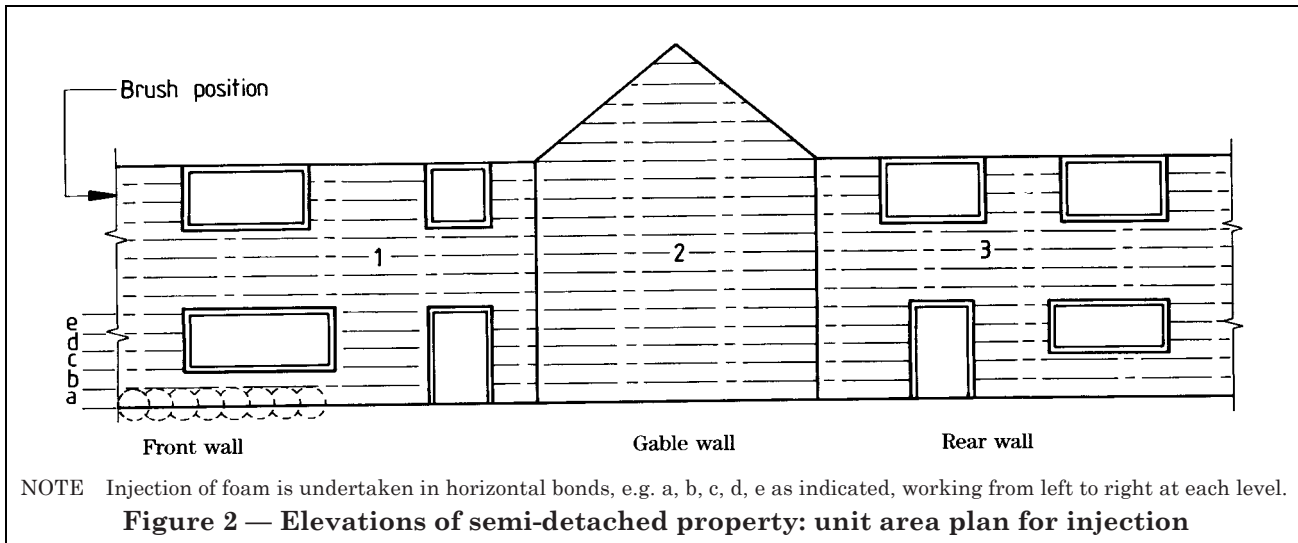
Elevations of semi-detached property: unit area plan for injection
